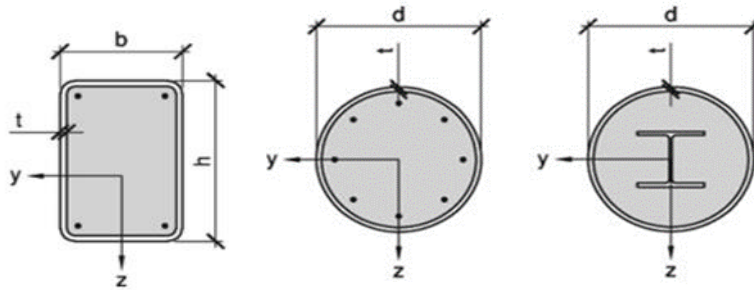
Typical cross-section of composite columns with the CFCC with reinforcement and steel profile embedded. ( Source: Buick Davison, 2012. [13]).
